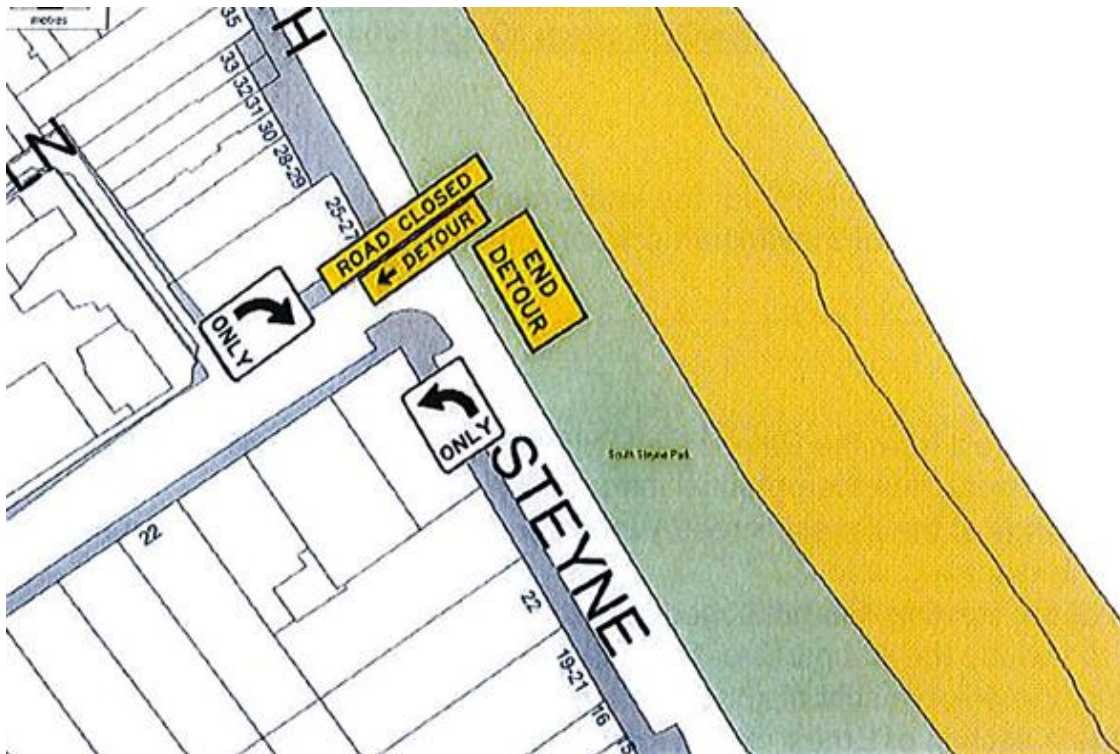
Site 1 – Intersection of North Steyne and Wentworth Street
